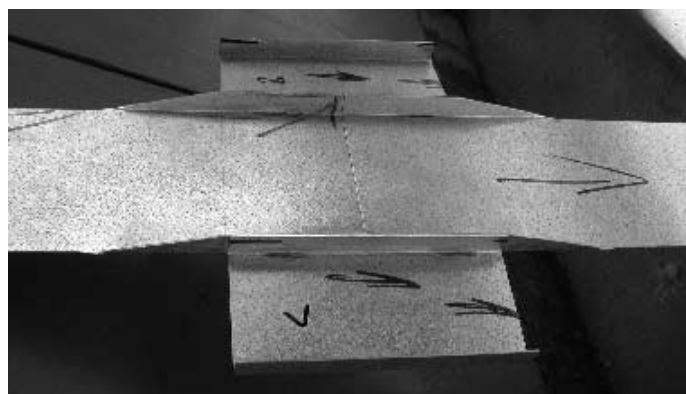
Tapered lips of middle sections for 1.5-mm sheet steel specimen
